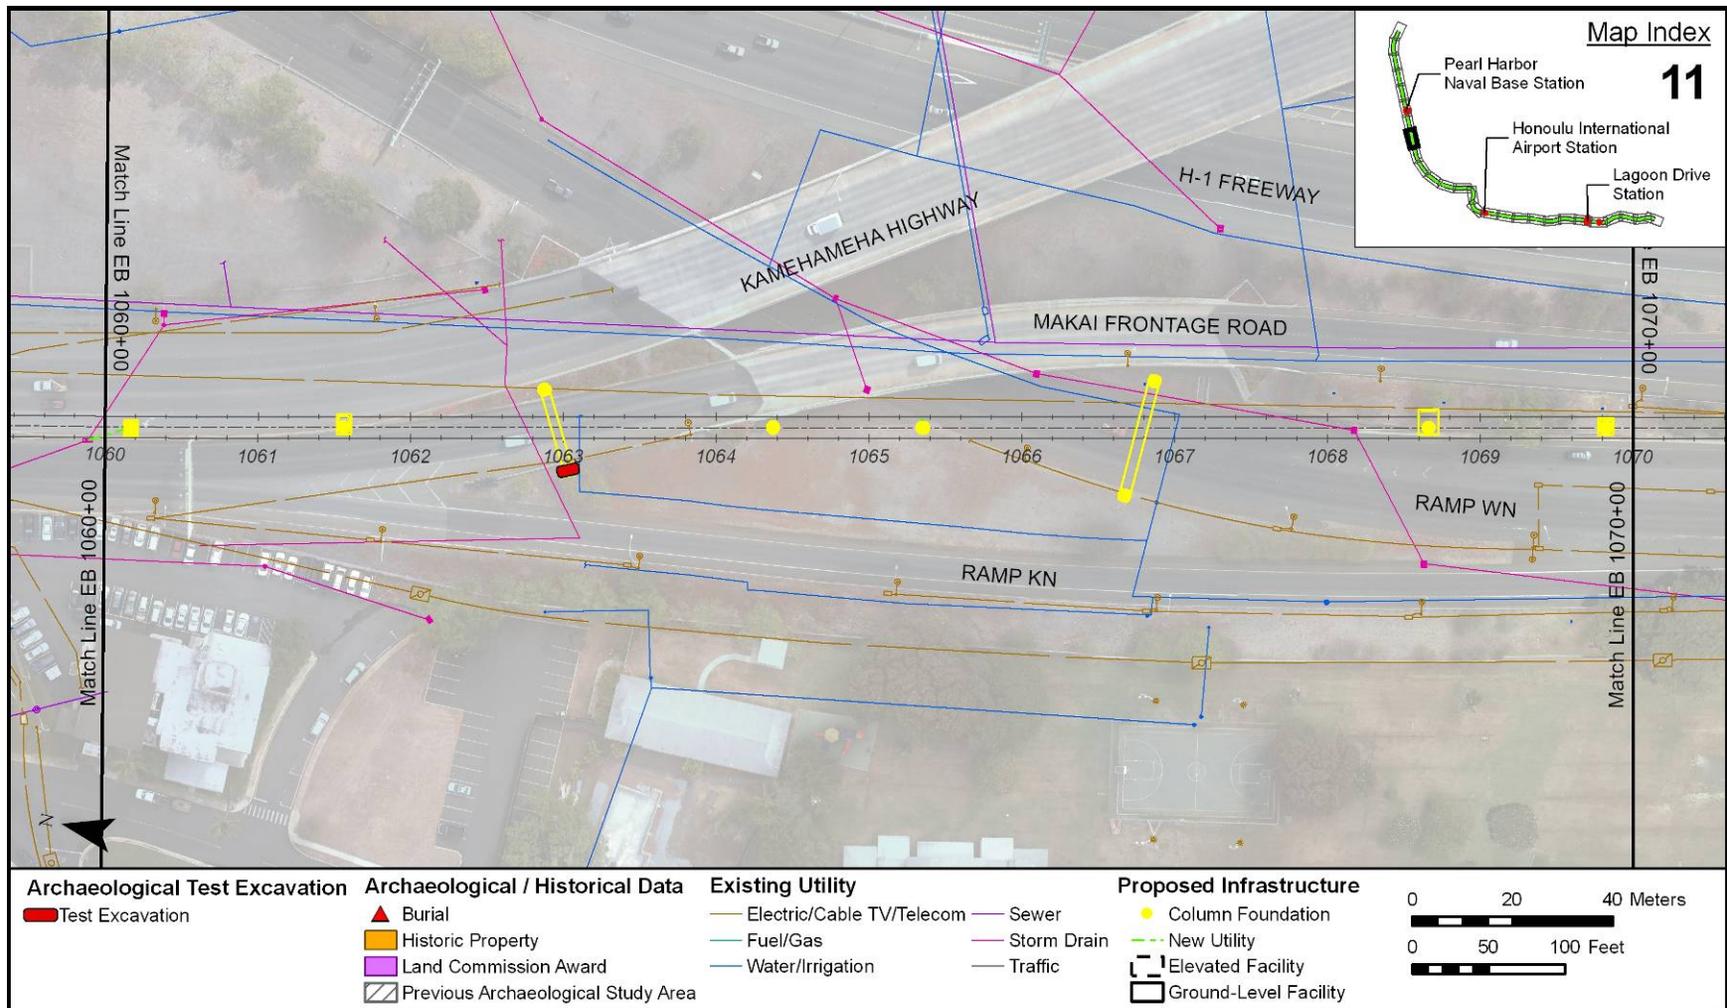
Map Sheet J 11 (near Makai Frontage Road), one 10x3 excavation at *makai* column foundation @ 1063+00
